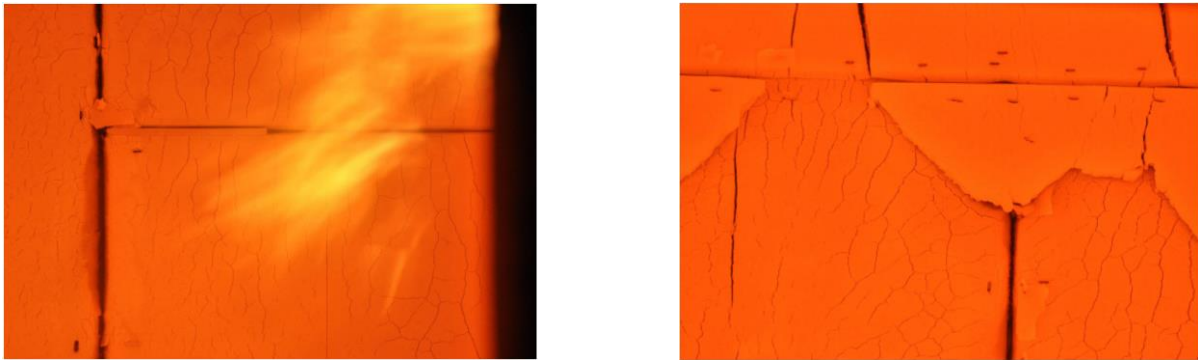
d: Two-ply fire protection plasterboard cladding exposed to fire during a large-scale fire test
